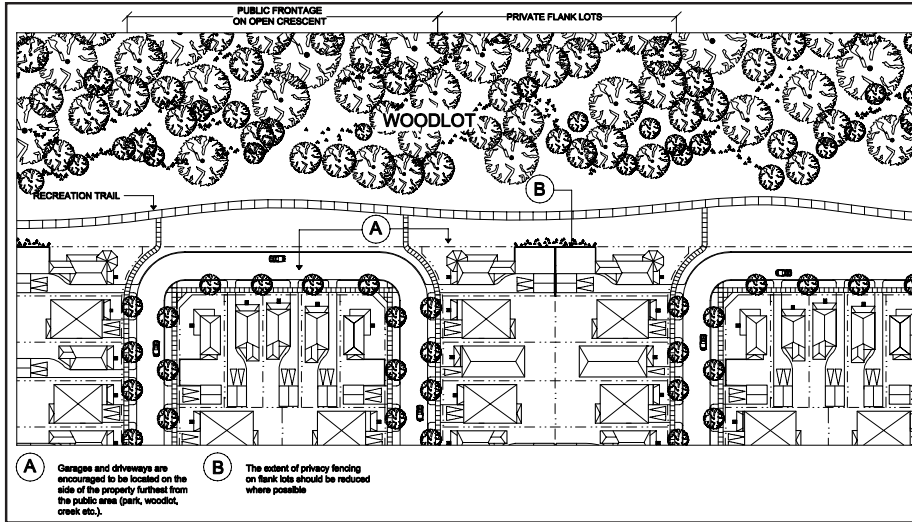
Single Loaded roads at woodlots promote public access and visibility.
